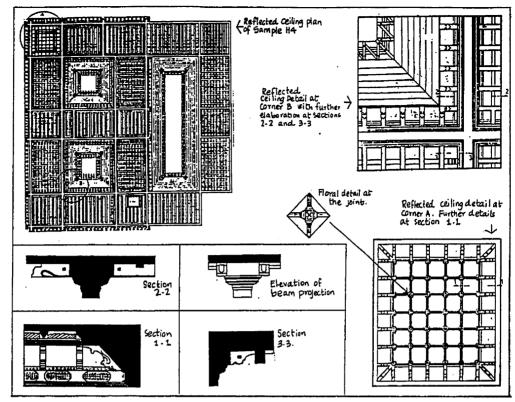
Ceiling details and beam sections of sample H4 (After: Kerala State Nirmithi Kendra, Documentation of traditional houses in Kerala, 1993).
